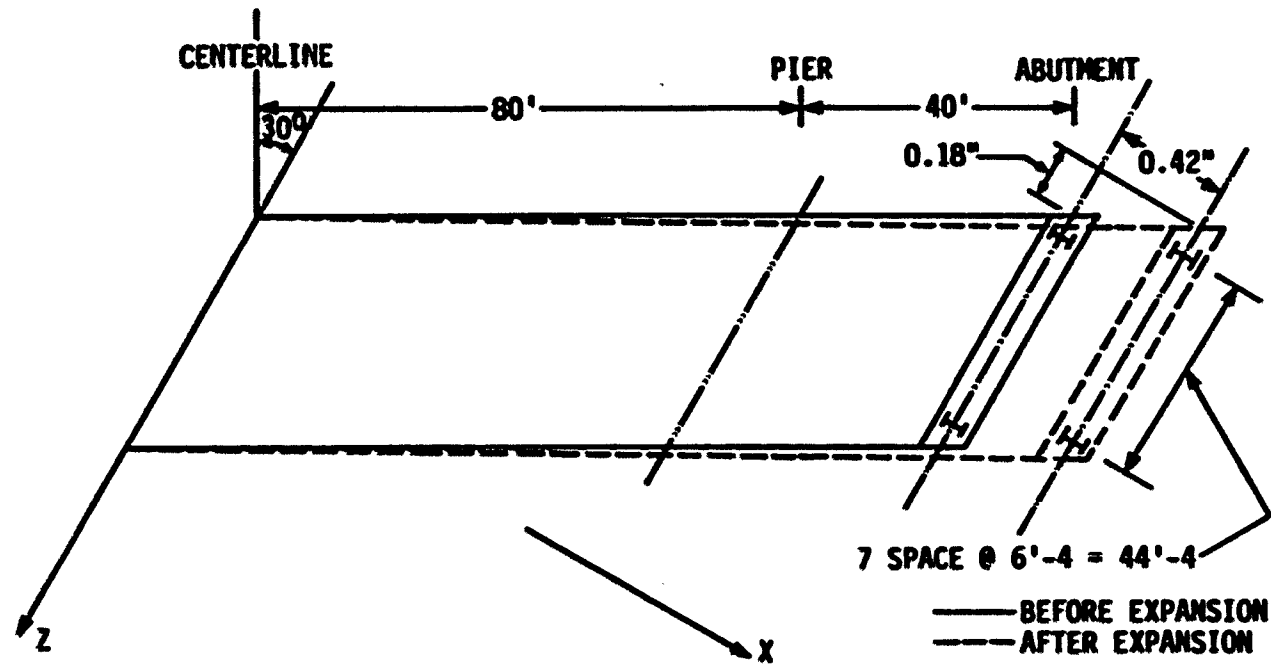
Plan view of skewed bridge and its global coordinates, before and after thermal expansion (see Fig. 48 for bridge cross section)
